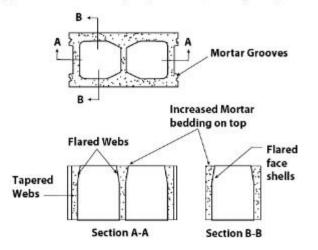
Typical Concrete Block Masonry Unit (Hollow Unit, with Flanged Ends)
